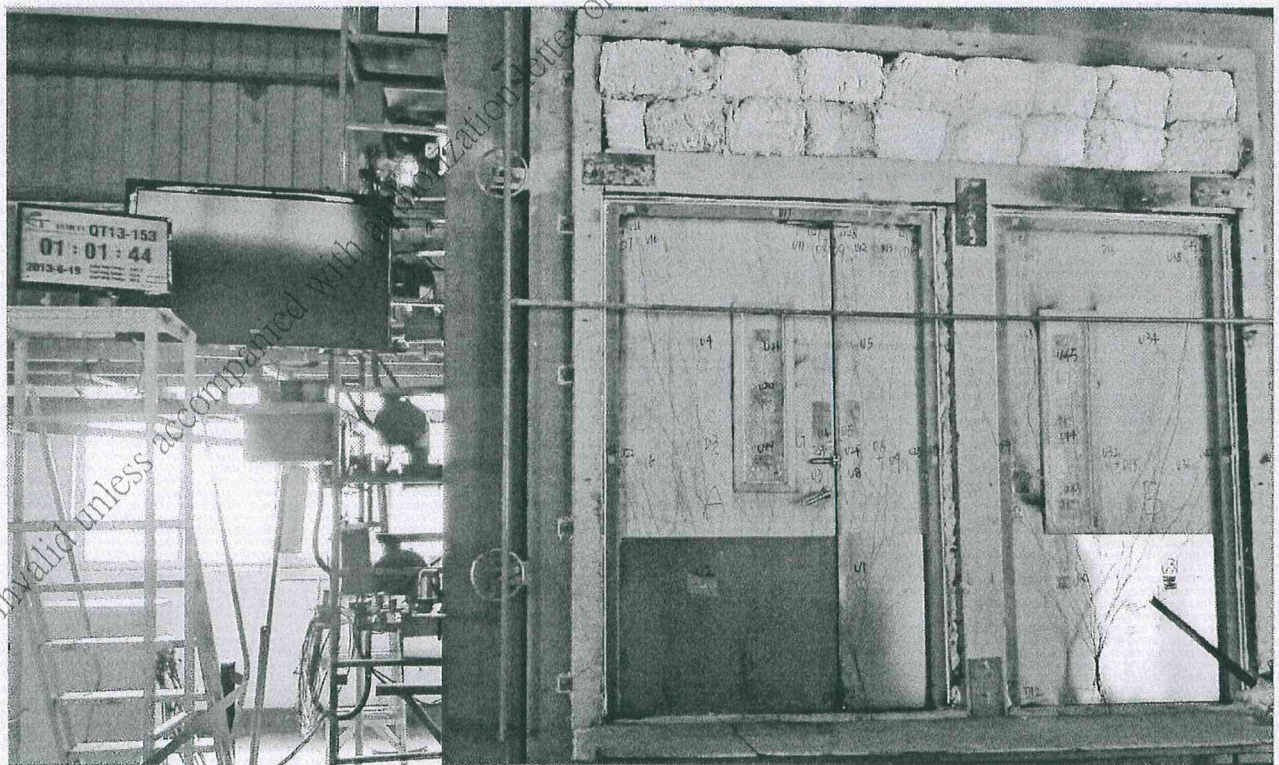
Unexposed surface of the specimen at 60 minute of test. (Left: Door A; Right: Door B)
